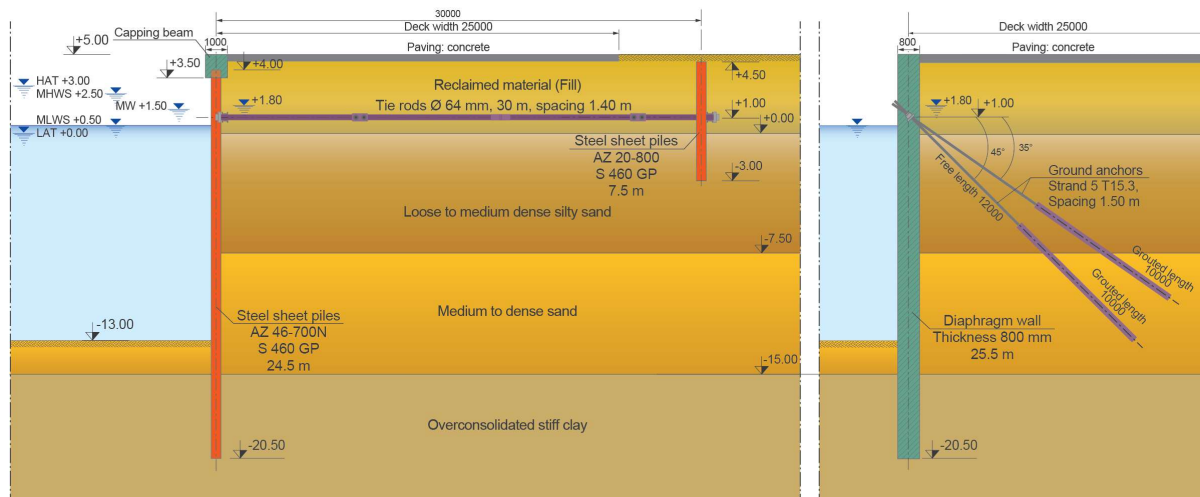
Case study - cross sections: steel sheet piles (left) and diaphragm wall (right)
